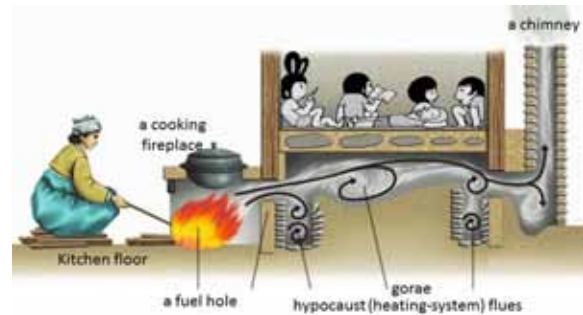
Ondol Section (Warm Floor: Floor Heating from Cooking Oven)
